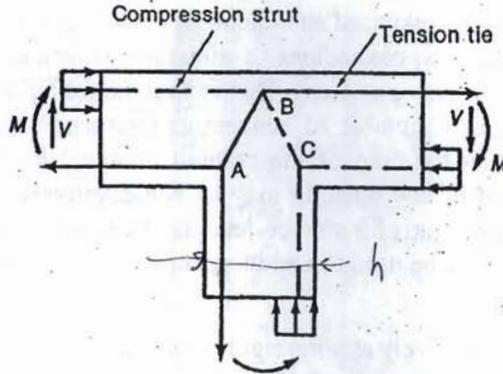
Beam-Column Joint Forces Based on Truss Model [6.26]
